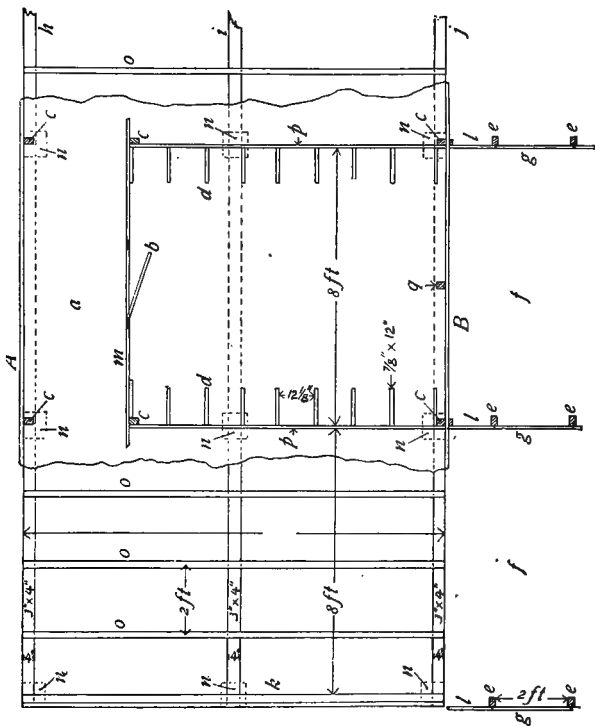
GROUND PLAN OF HOUSE (A), PEN (B) AND YARD (f).
